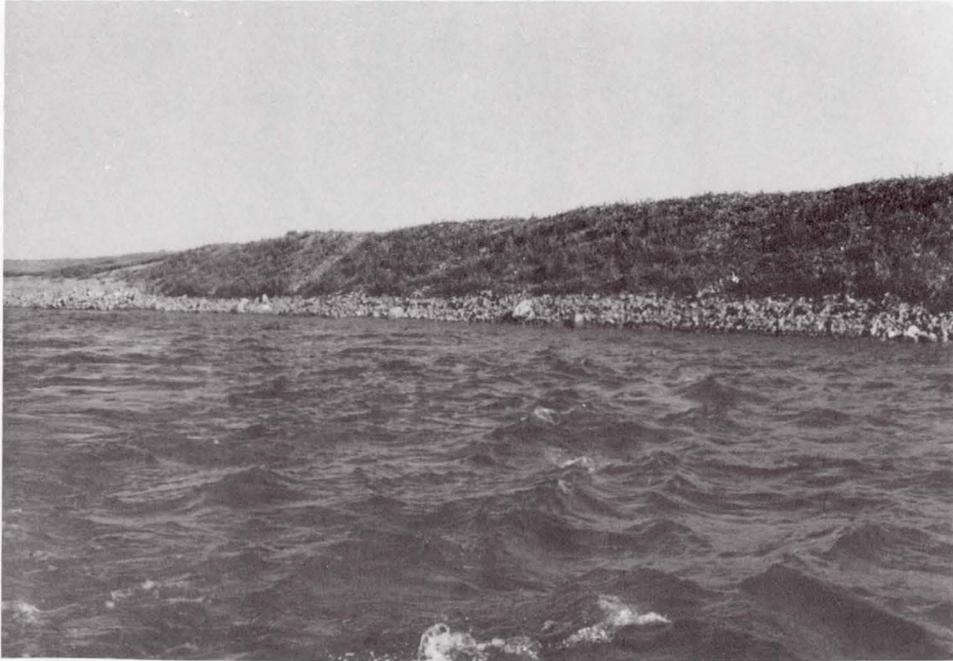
Reinforced Revetment 1366.7, Station 3+00 to 7+00,
